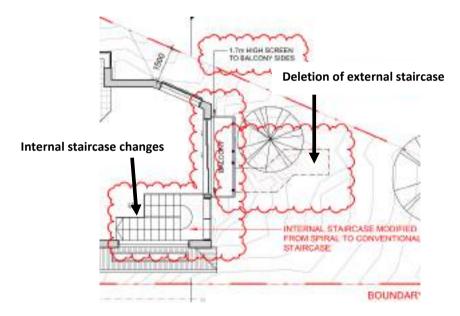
Rear balcony, Deletion of external staircase and Changes to the internal staircase
